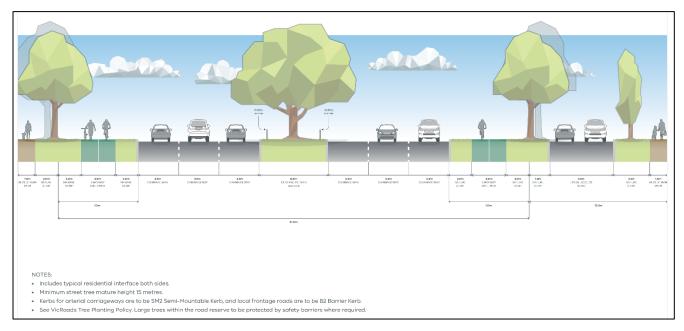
Primary arterial cross section - six lane 41m (Source: VPA)
